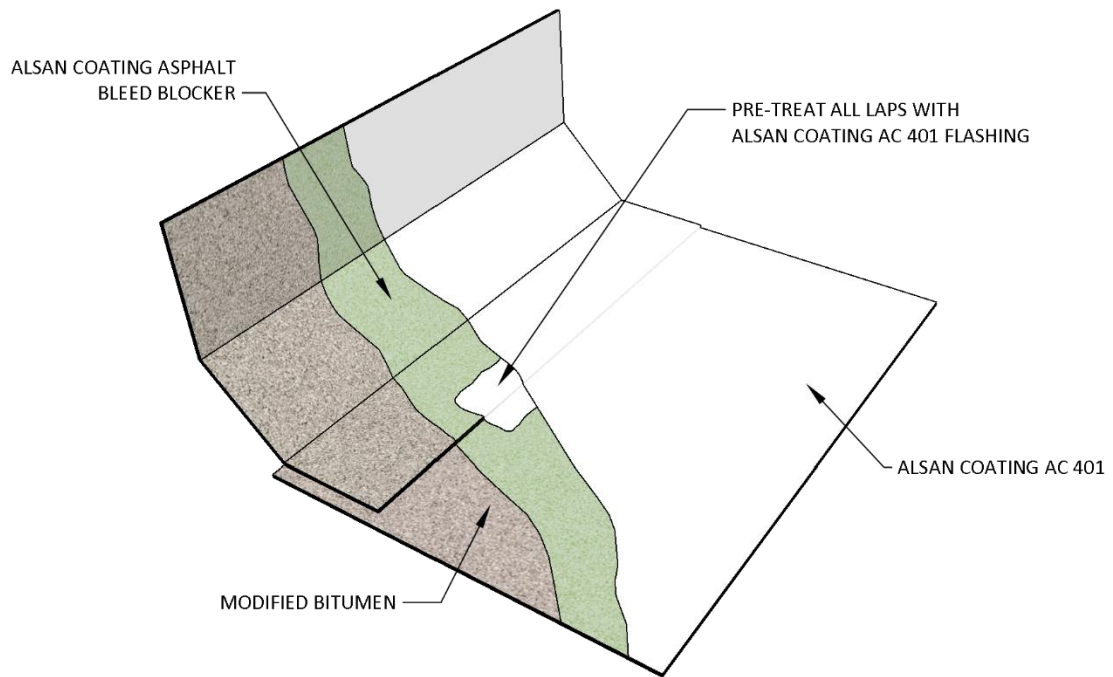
Acrylic Roof Coating Over Modified Bitumen, Wall/Curb
